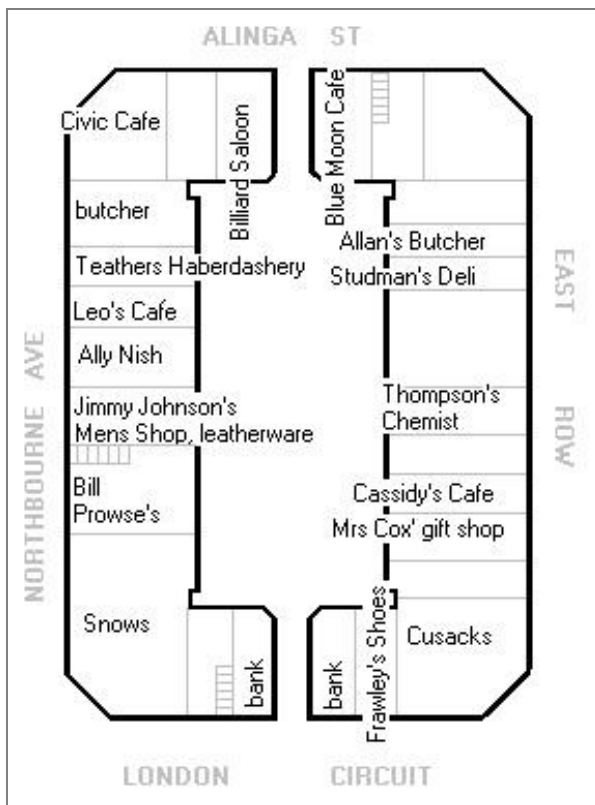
Plan of the Sydney Building by Michael Hall, based on the recollections of Roma Prowse. It shows occupants of the building around early to mid-1930s. The plan should be used with caution.
